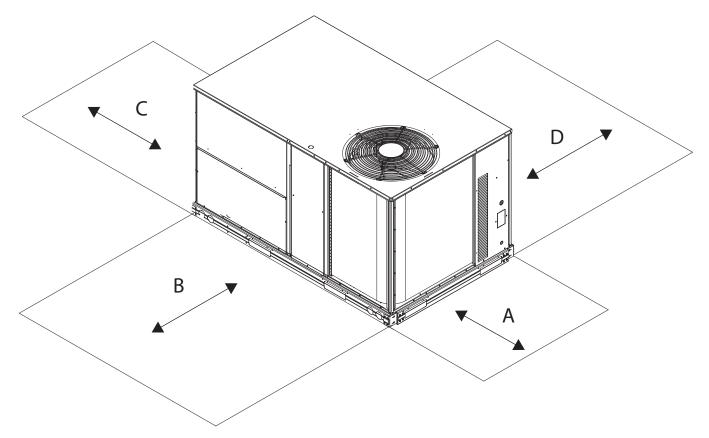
Unit Dimensional Drawing – 120 Size Unit (cont)
